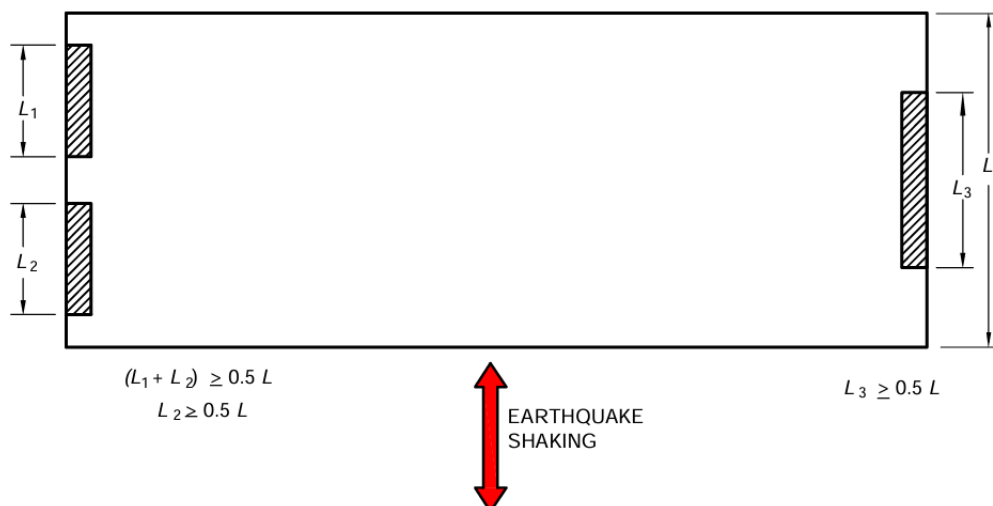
AT LEAST TWO PARALLEL LINES OF WALLS ARE REQUIRED
